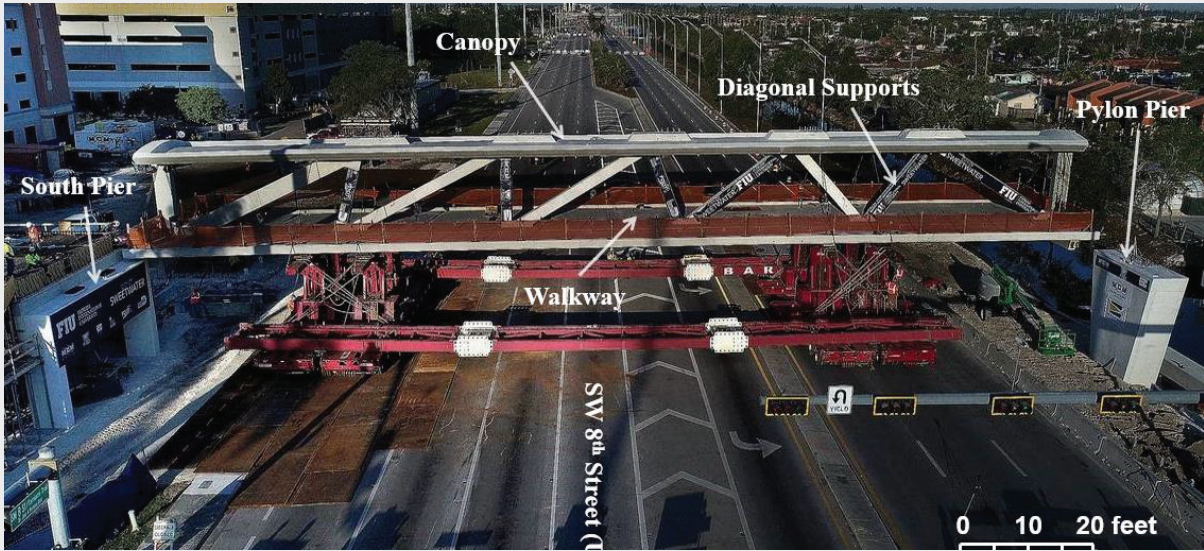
Main span being moved on March 10, 2018 prior to placement on the south pier and pylon pier, looking to the west (Source: NTSB Factual Report)
